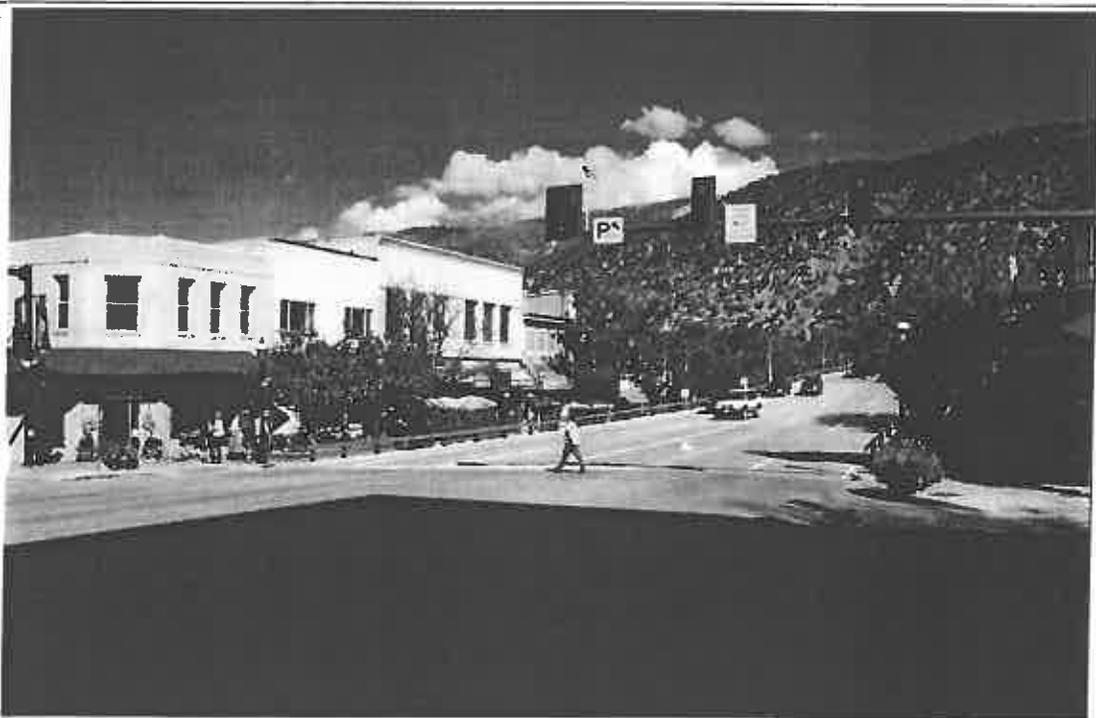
Existing and Proposed Bridge Heights, Illustrates existing and proposed bridge height relative to buildings adjacent to Grand Avenue
